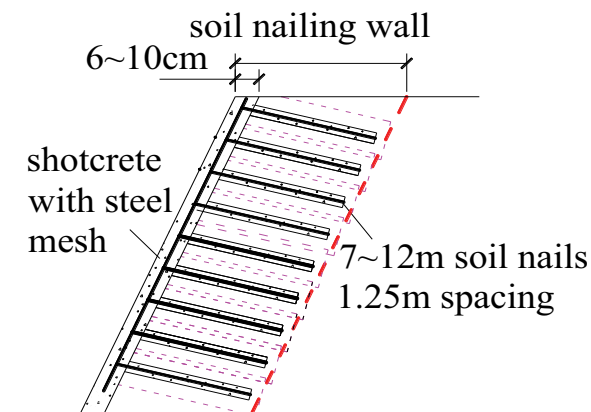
Reinforcement principle sketch of soil nailing wall
